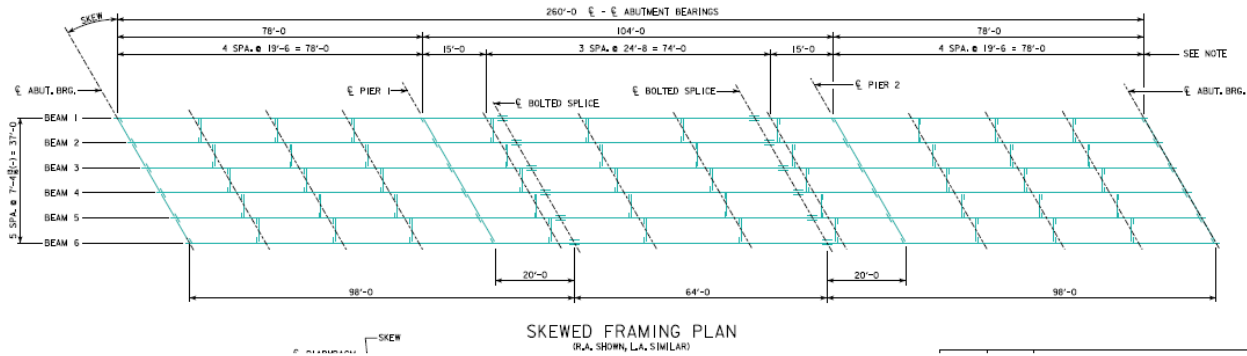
30° skew 260 ft Standard Bridge framing plan
